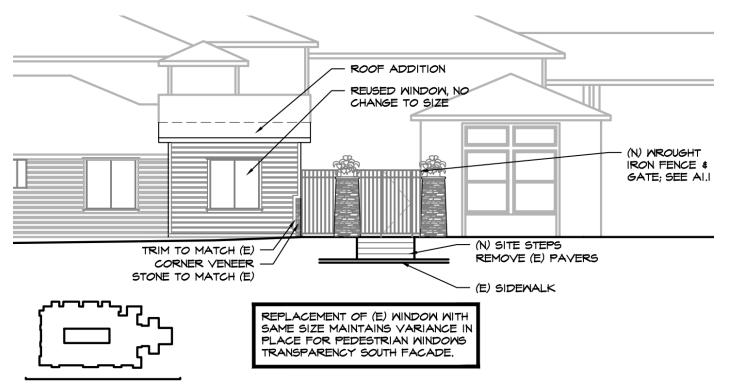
Modifications to South Elevations – Enlargement - (Not to Scale)
